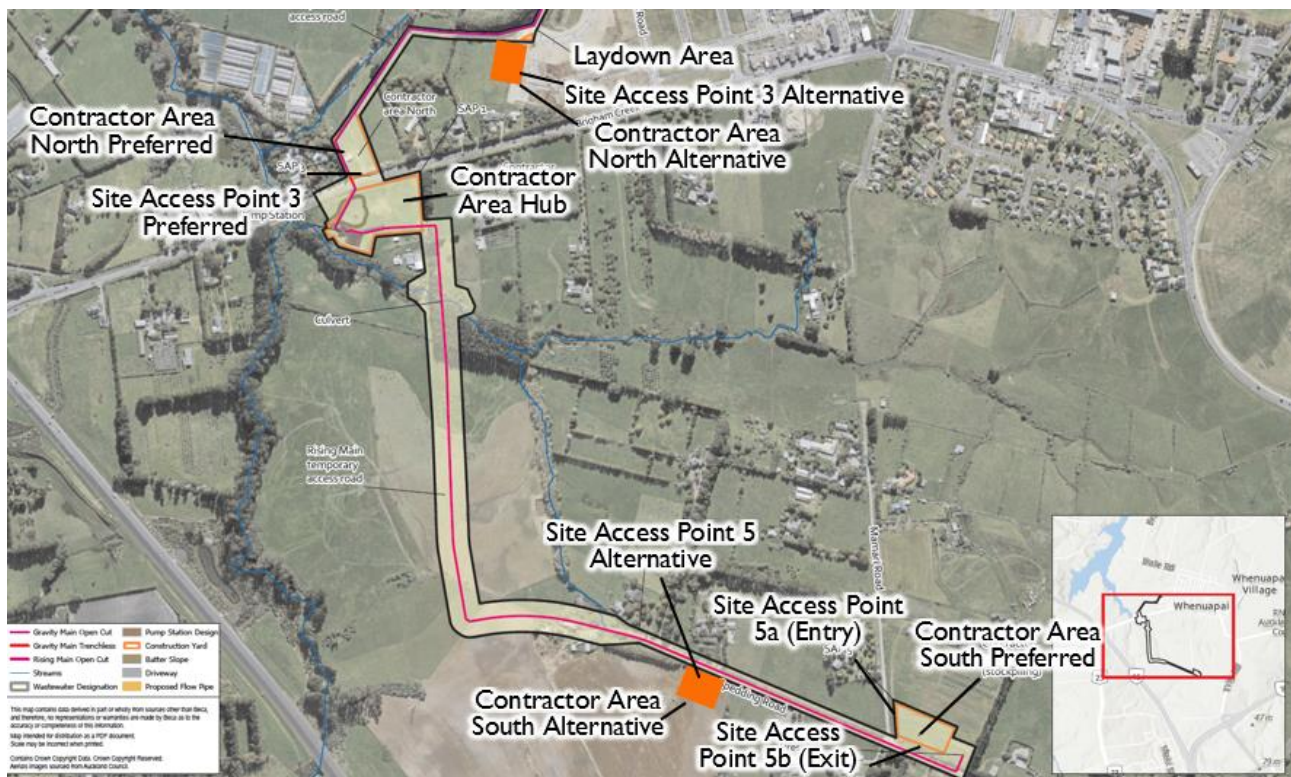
Proposed construction yards for the Whenuapai Package 1 project.
